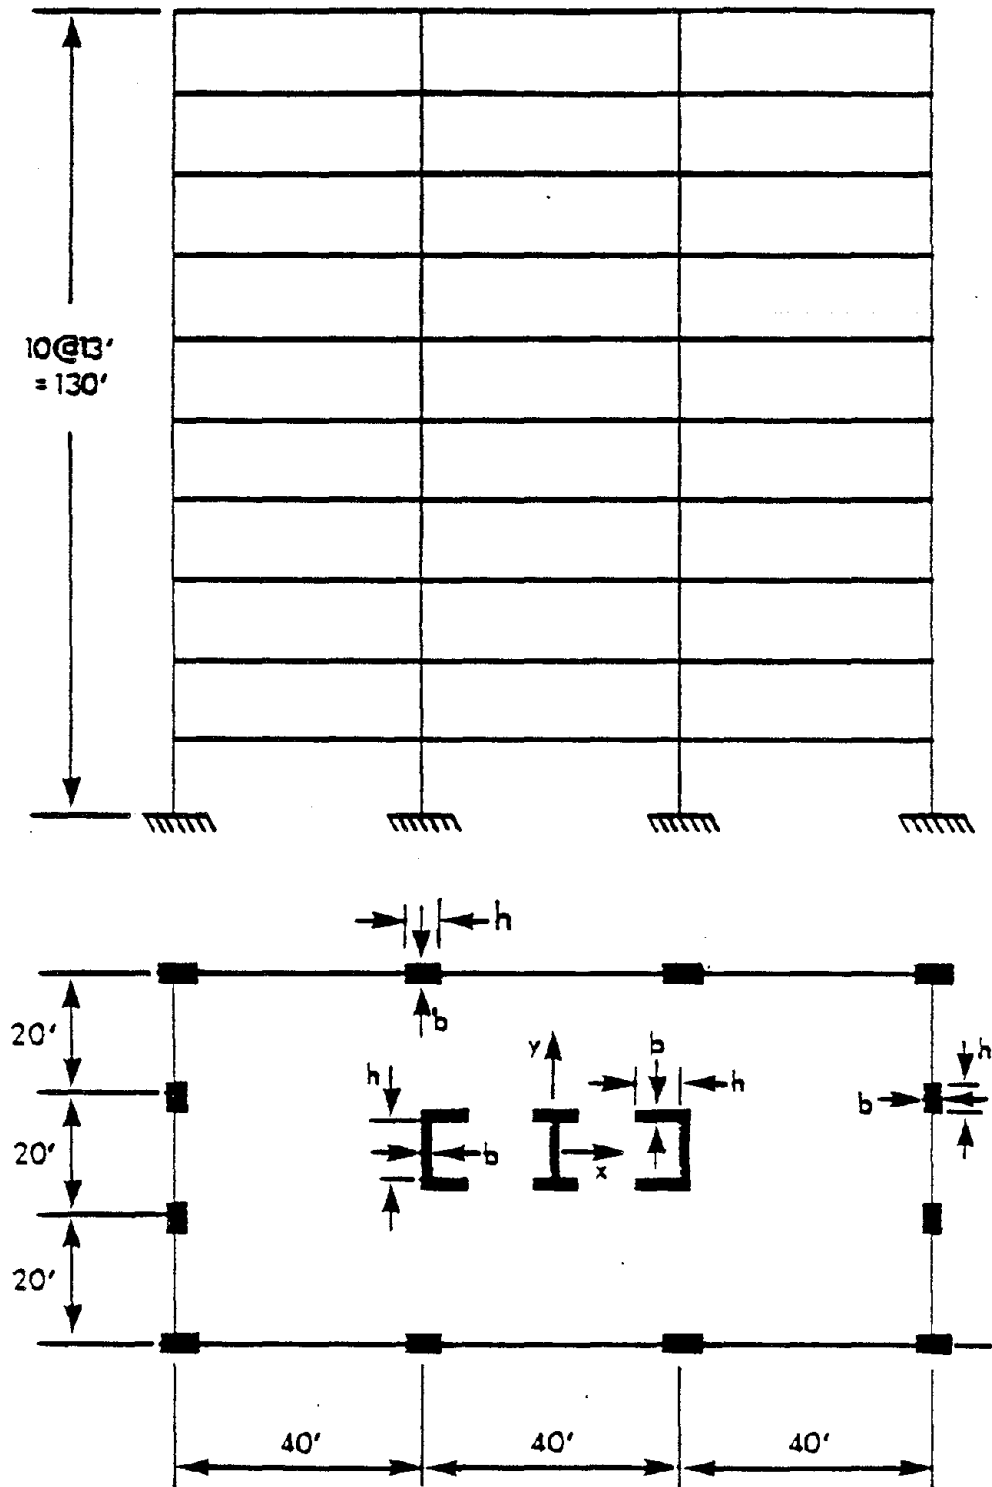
Ten Story Concrete Structure with Steel Beams (1' = .305m)
